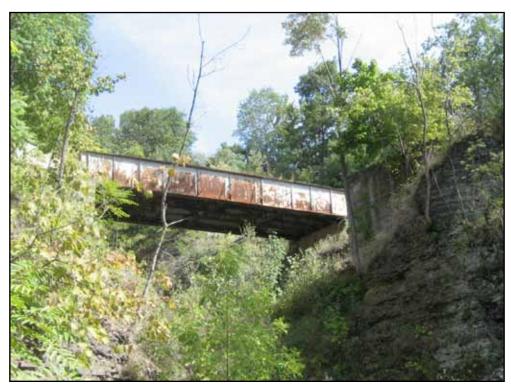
View of the bridge from the middle Island with the original building foundation at right. (Photograph by author).
